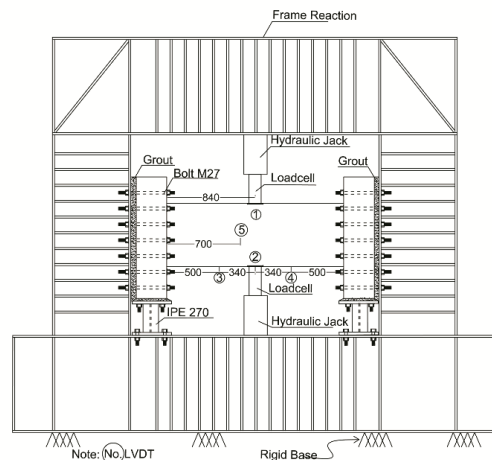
Schematic view of typical set-up equipment (all unit in mm)
